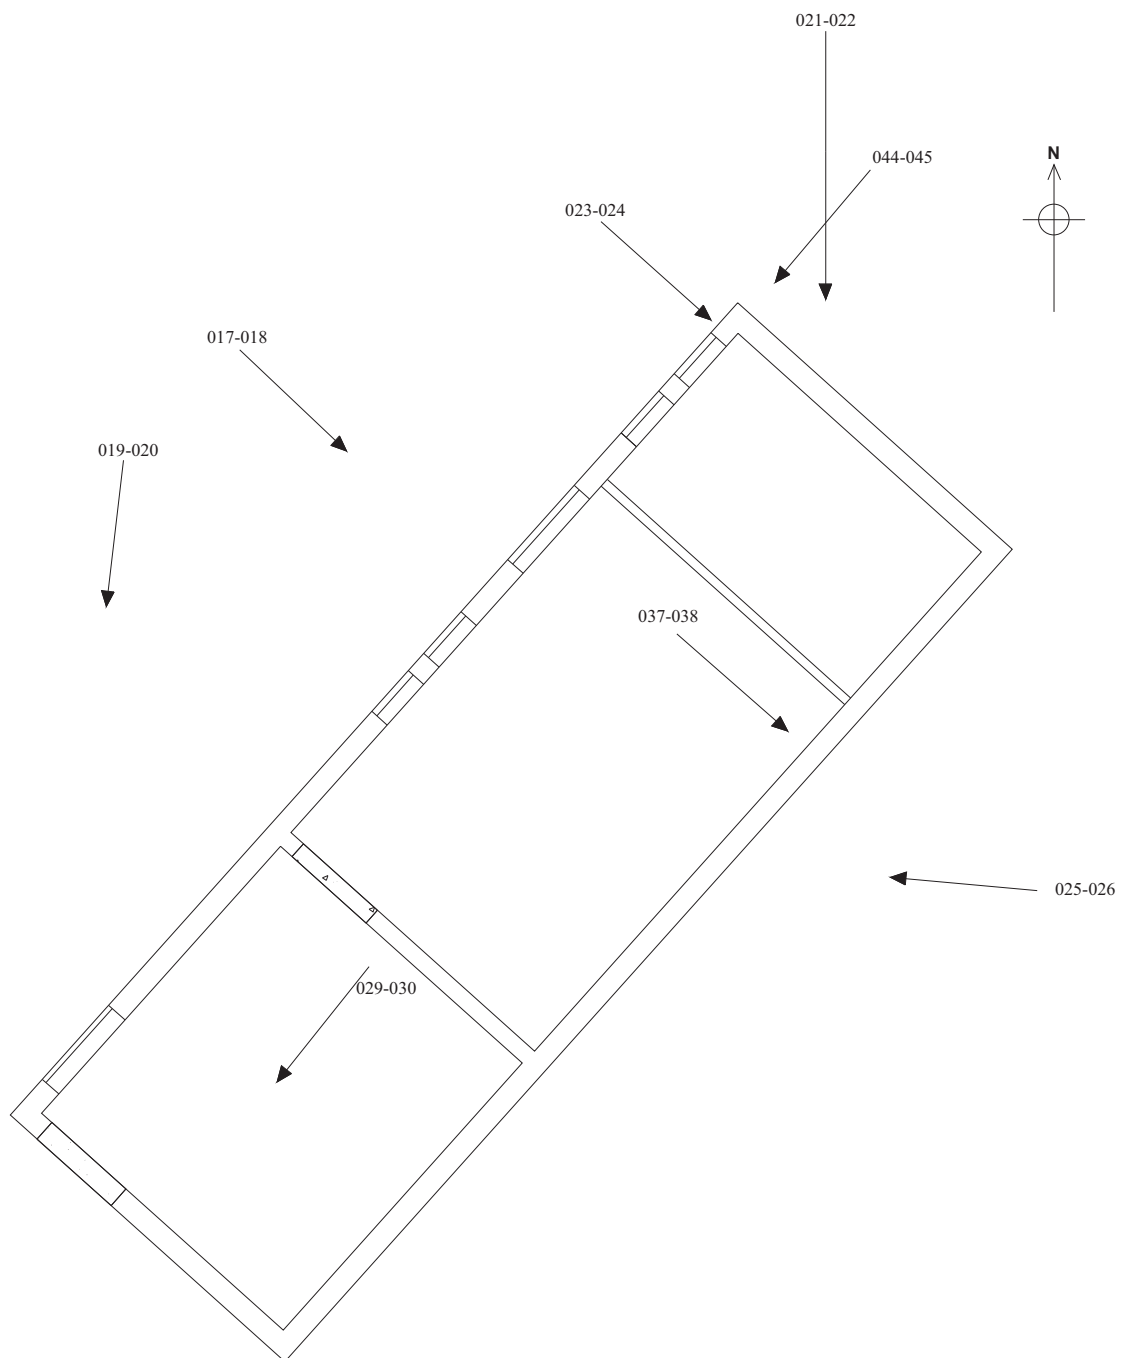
Sketch Plan of Building 2 showing direction of photographs mentioned in the text.
